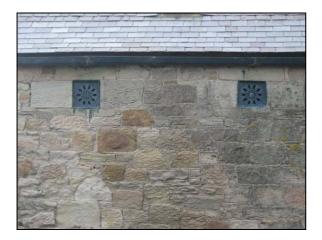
North elevation, detail of decorative vents Plate 2 North elevation, dressing around main arched entrance
